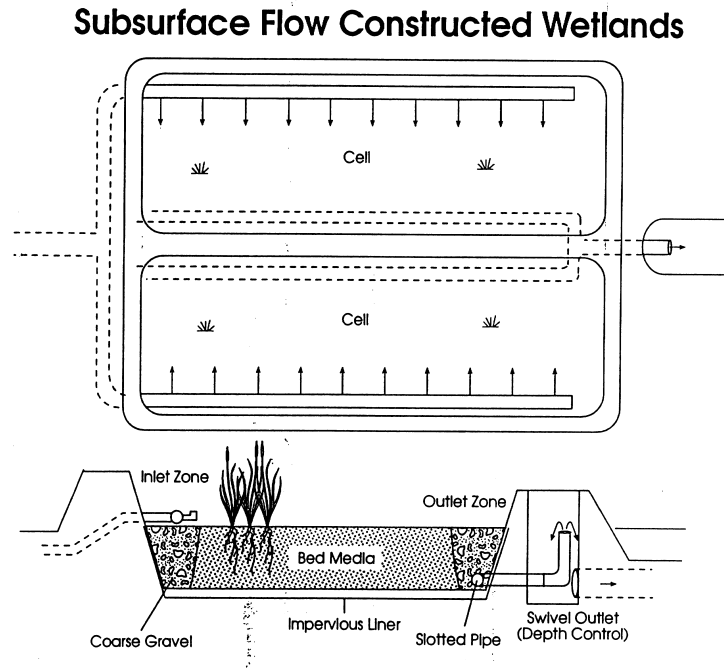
Subsurface Flow Constructed Treatment Wetland Typical Plan and Profile ¹³.
